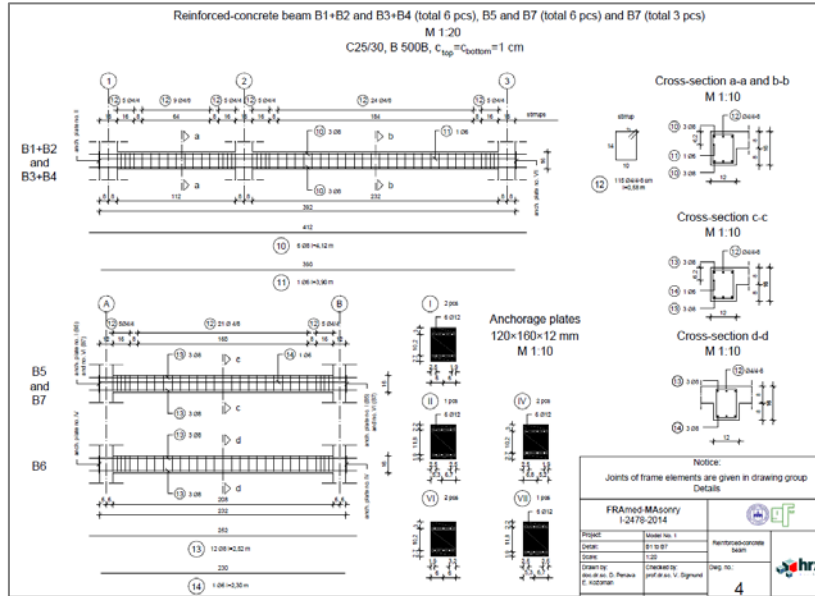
Formwork and reinforcement details – Model IW-SB, (contd.)
